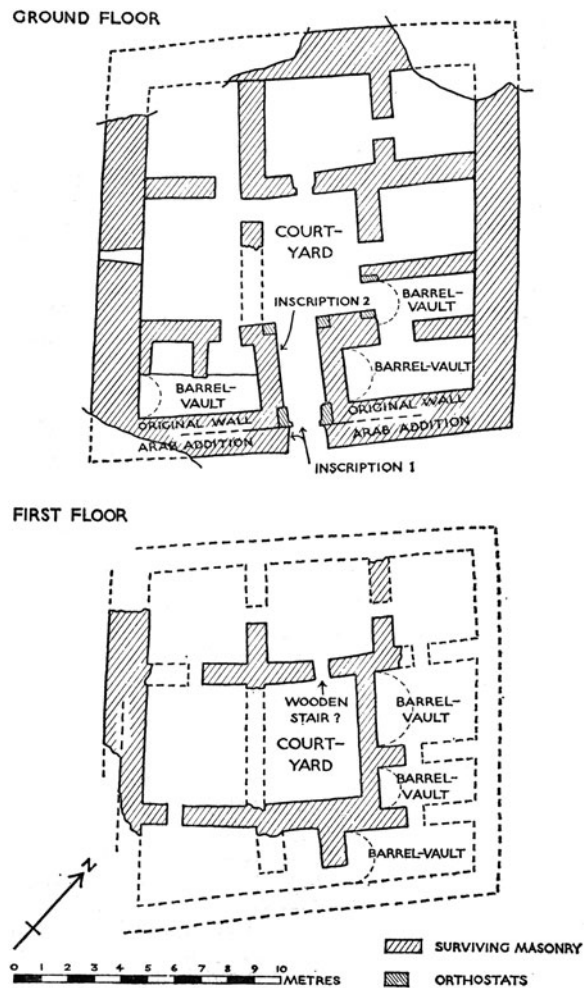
Novum centenarium of Gasr Duib: plans of the ground floor and first floor (Goodchild and Ward-Perkins 1949; Goodchild 1976, 25).
